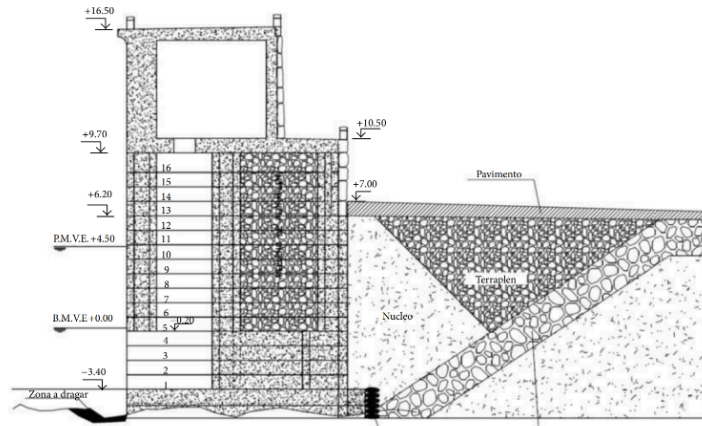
Capture chamber construction plan of Mutriku wave plant.
